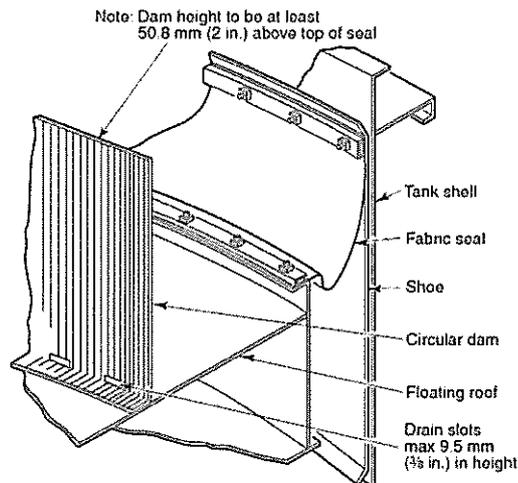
Typical Foam Dam for Floating Roof Tank Protection.
